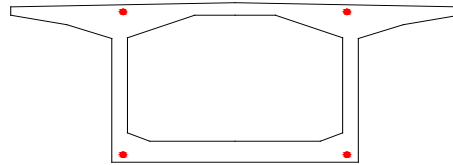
Layout of measuring points for stress on the control cross-section of the box girder
